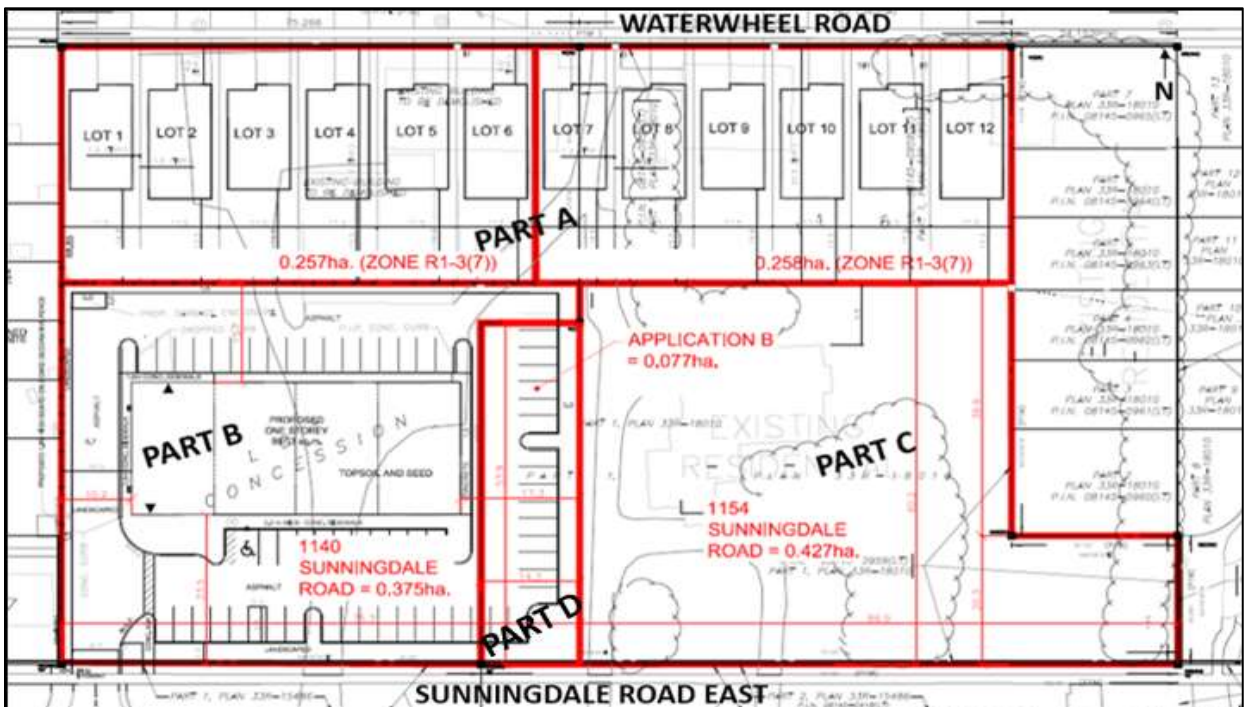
Conceptual Site Plan – Parts, A, B, C & D
